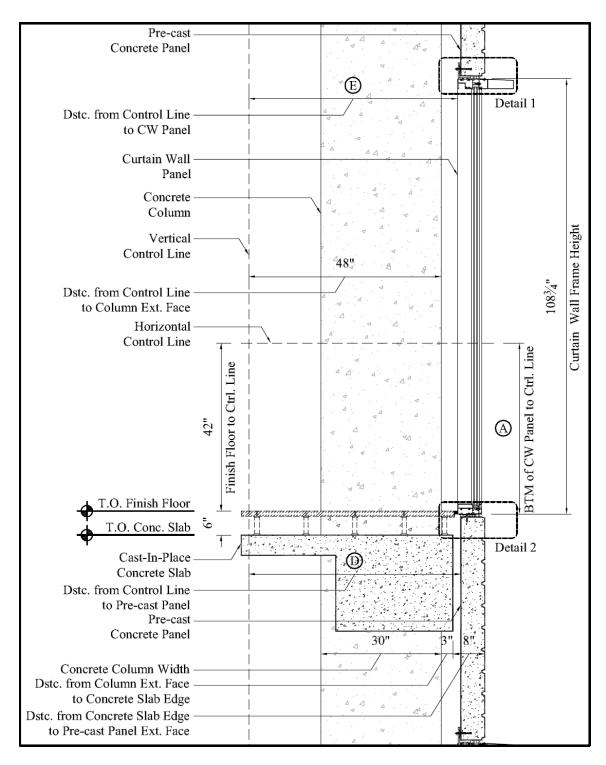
Partial façade section from 2nd to 7th floor. Letters A, D, and E denote the location of the cladding systems with respect to the control lines. Adapted from Dietzmann, J. M., Jr. (2014).
